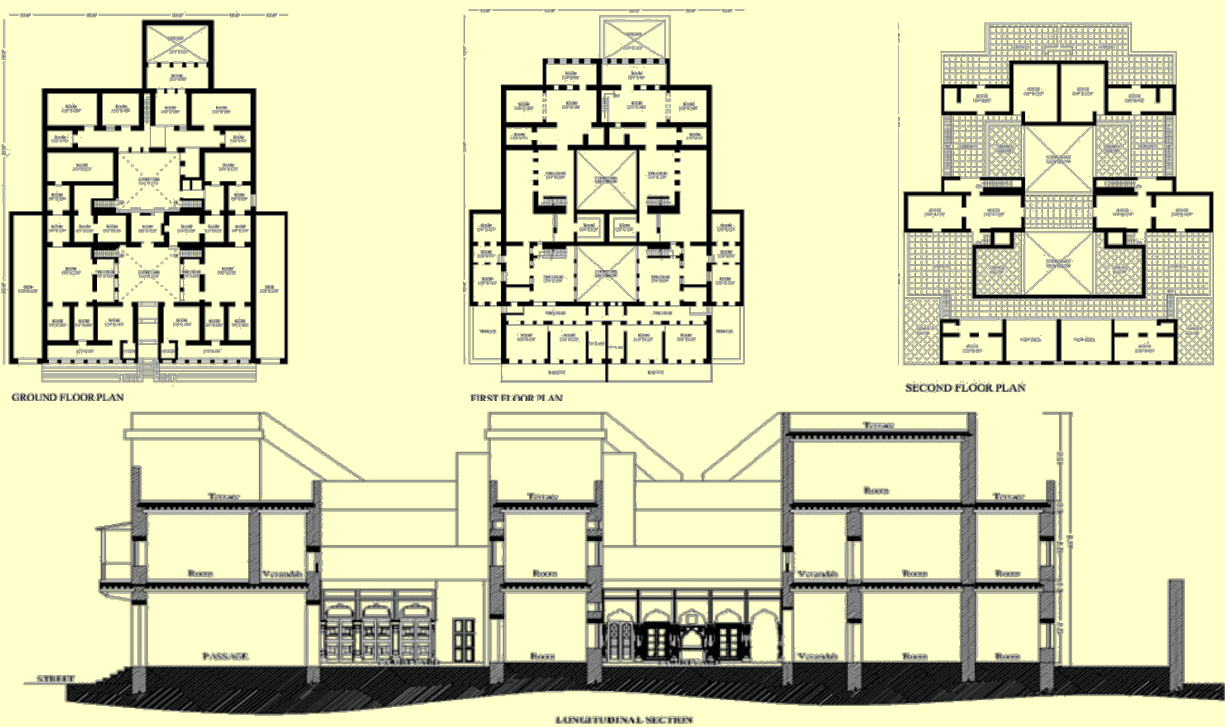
FLOOR PLANS AND SECTION OF HAVELI IN MALWA REGION, PUNJAB
